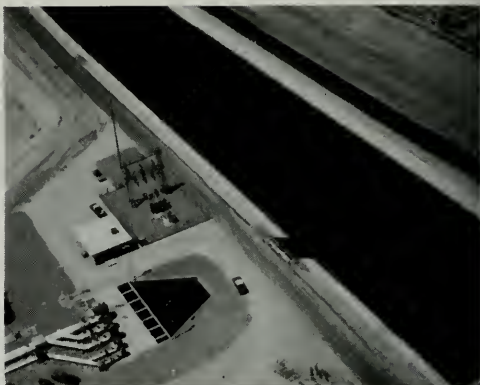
Turnout and Pumping Station for Belridge Irrigation District Near 7th Standard Road
